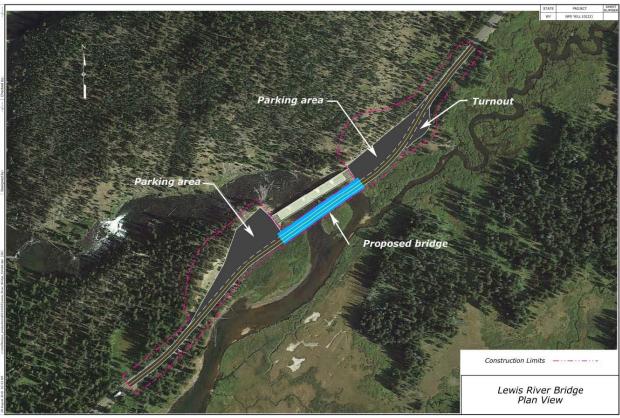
Alternative B (Preferred)—replace bridge on new alignment east of existing bridge.
